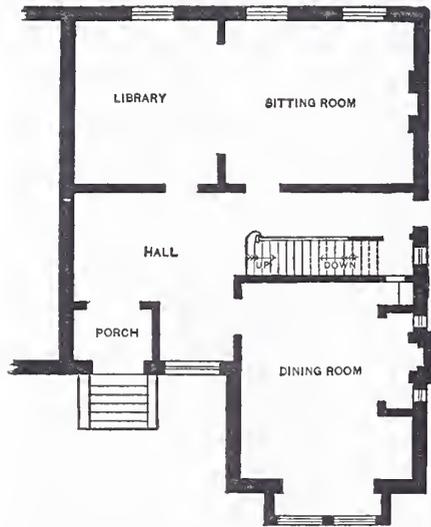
Floor Plan showing Location of the Dining-Room.—Scale, 1-16 Inch to the Foot.
